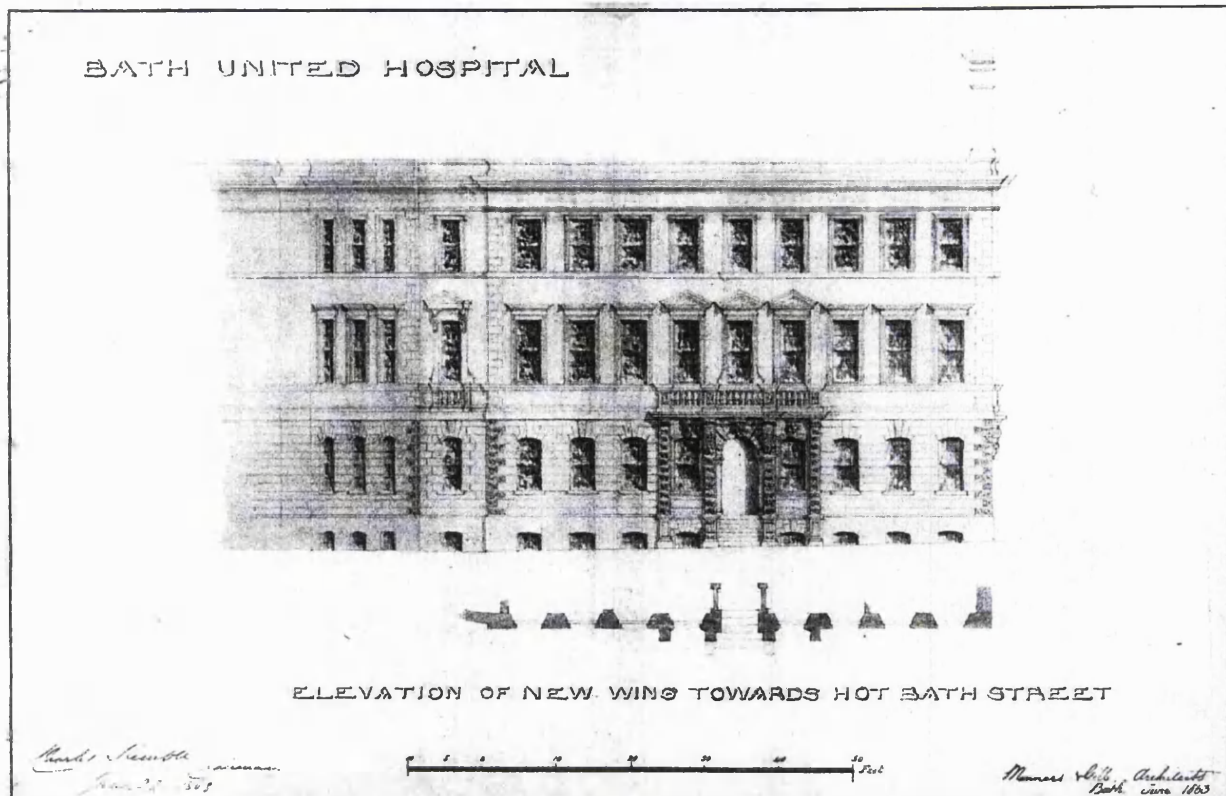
(Top, centre). Albert Wing: elevation to Hot Bath Street. Signed: Manners &amp; Gill, June 1863.
